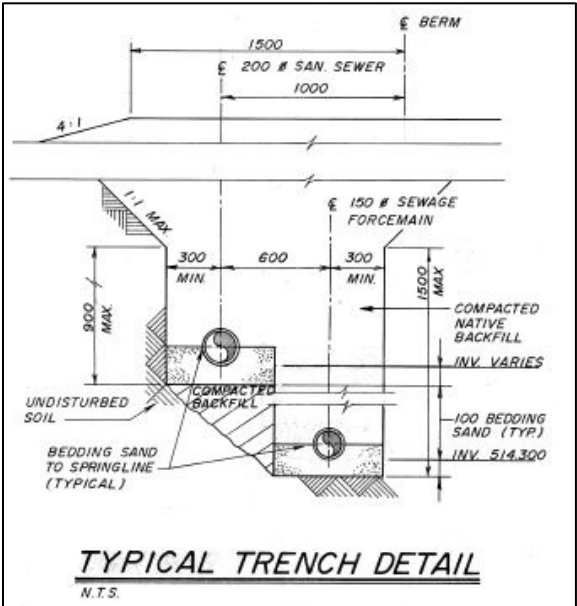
1988 Construction drawing - Force main and sanitary main trench details (Modified from Bullée Consulting Ltd. 1988b)
